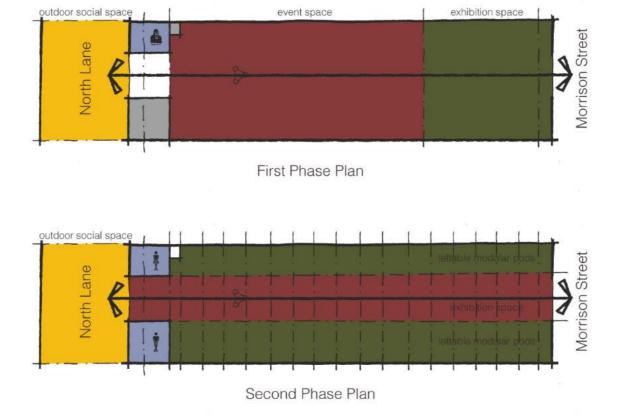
Floor plans for First Phase and Second Phase 8 Morrison Street
